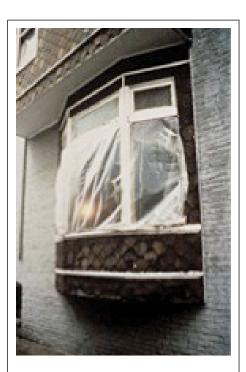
Windows sealed to prevent migration of dust outside.
